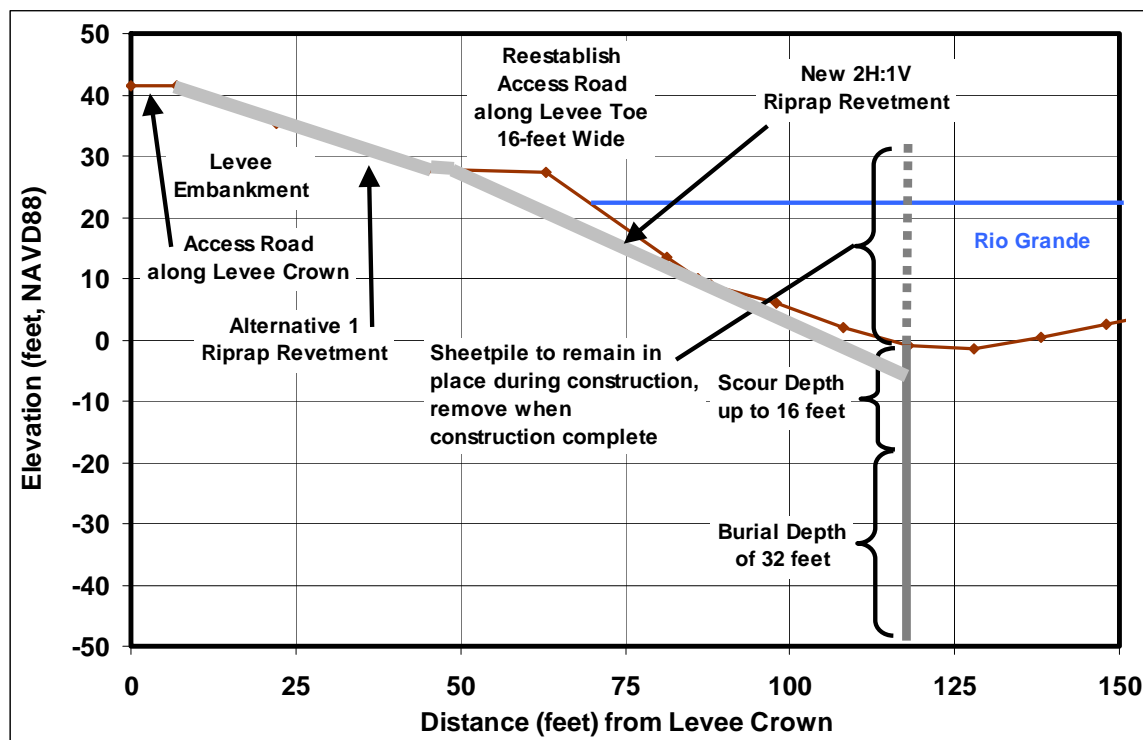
Embankment Protection – Riprap Upper Bank with Sheetpile for Future Scour
